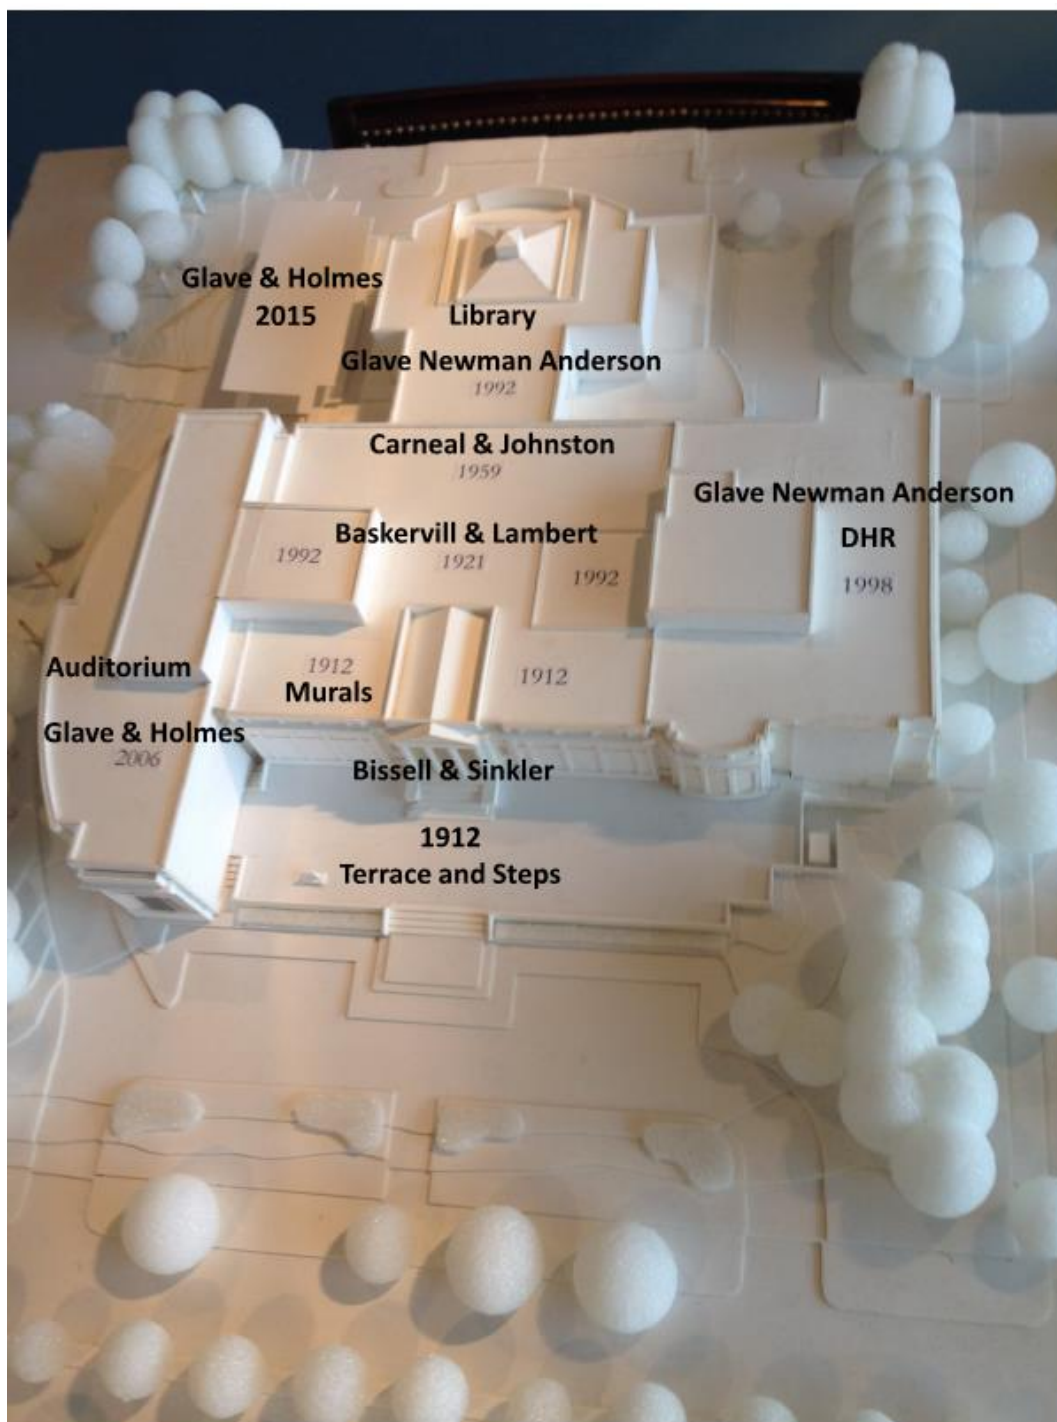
Floor plan with dates of construction. Courtesy of Sadler and Whitehead.
